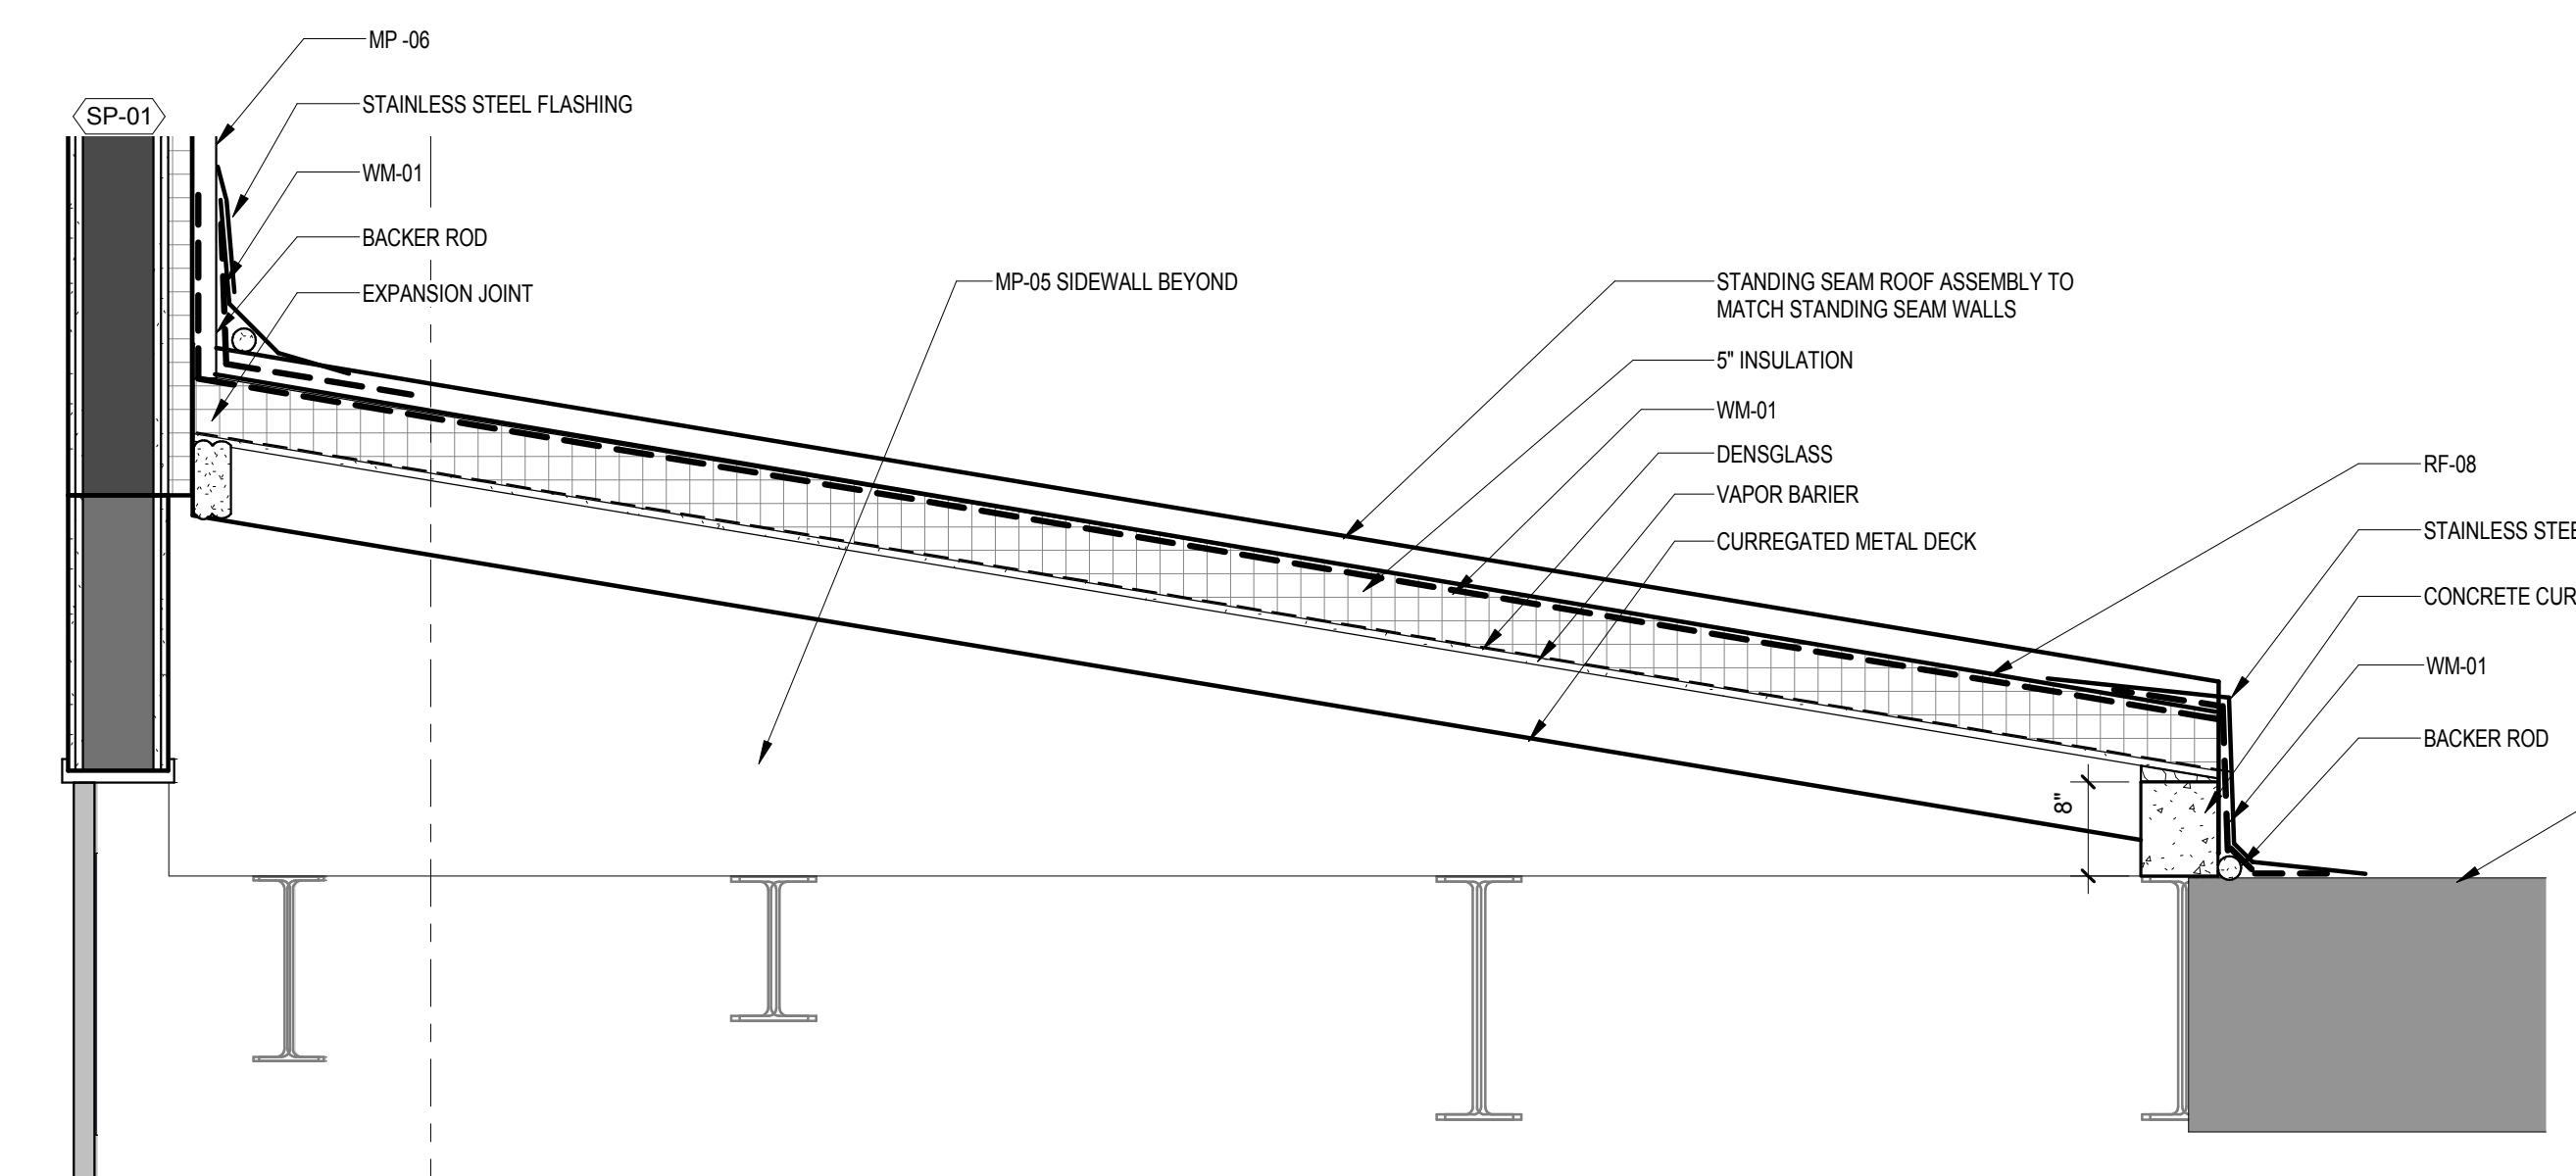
DETAIL AND WATERPROOFING AT FLEXNER HALL COL. LINE 4.75
